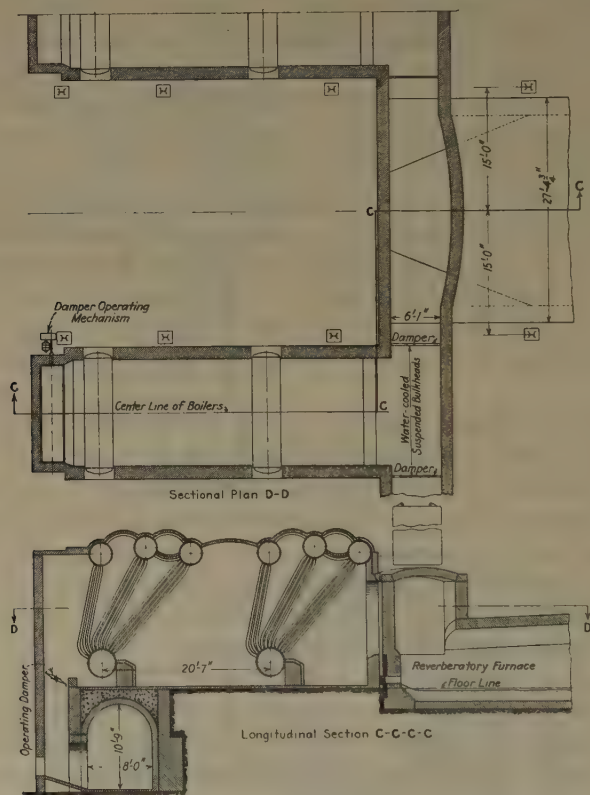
ARRANGEMENT OF ENLARGED FURNACE AND WASTE-HEAT BOILERS, ANACONDA.
